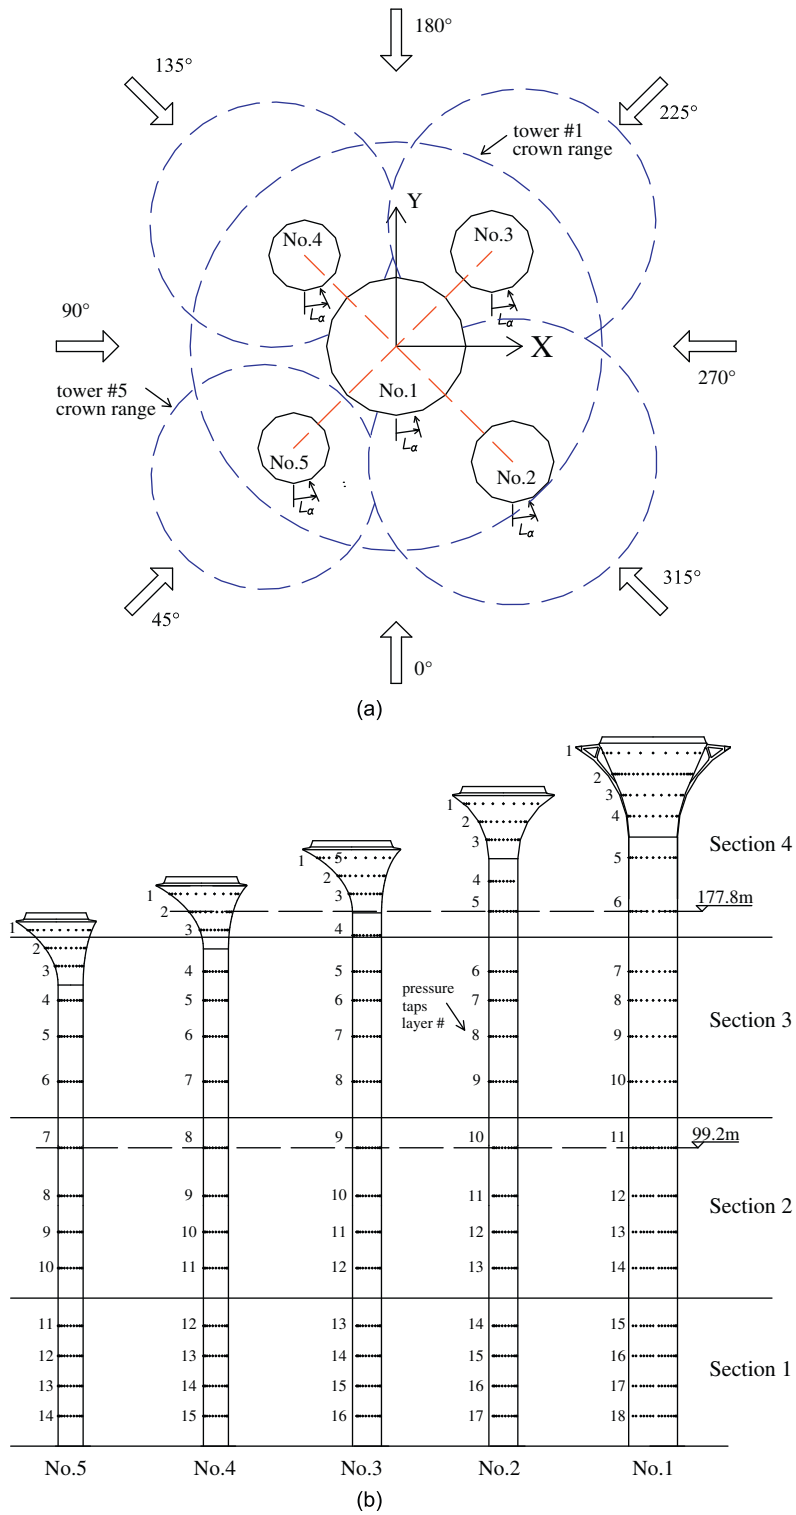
Layout of group-tower and pressure taps layout: (a) vertical view and (b) elevation.
